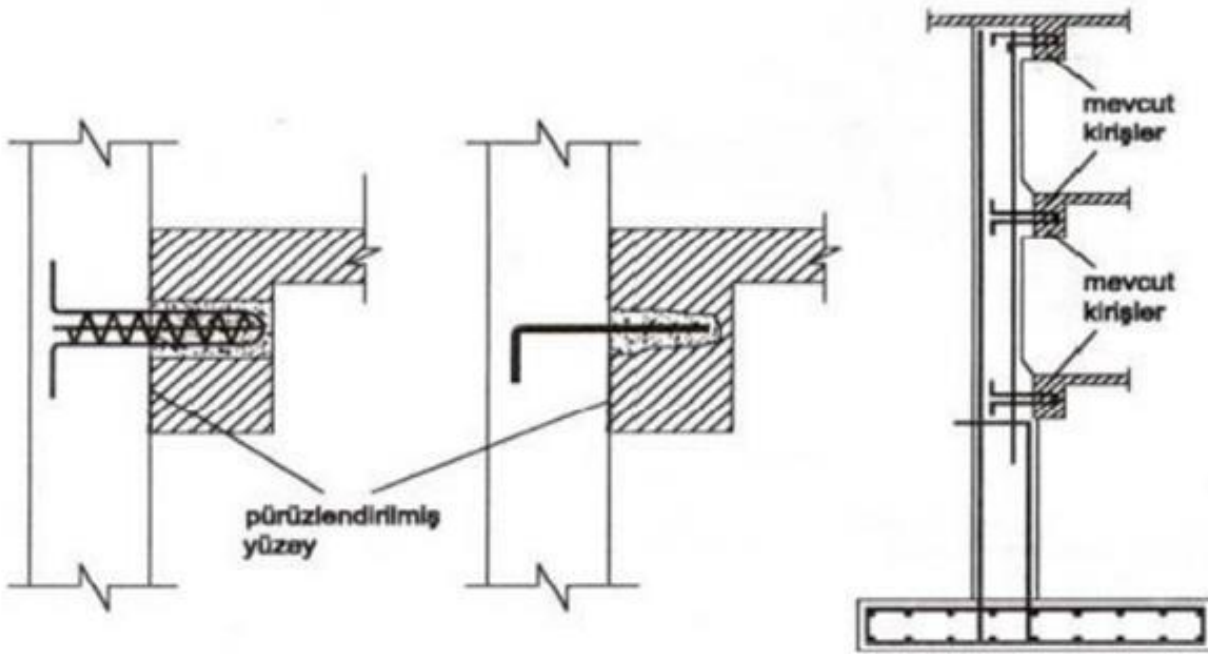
Connecting the exterior curtain walls to the adjacent frame with anchor rods (Öncü, 2011)
